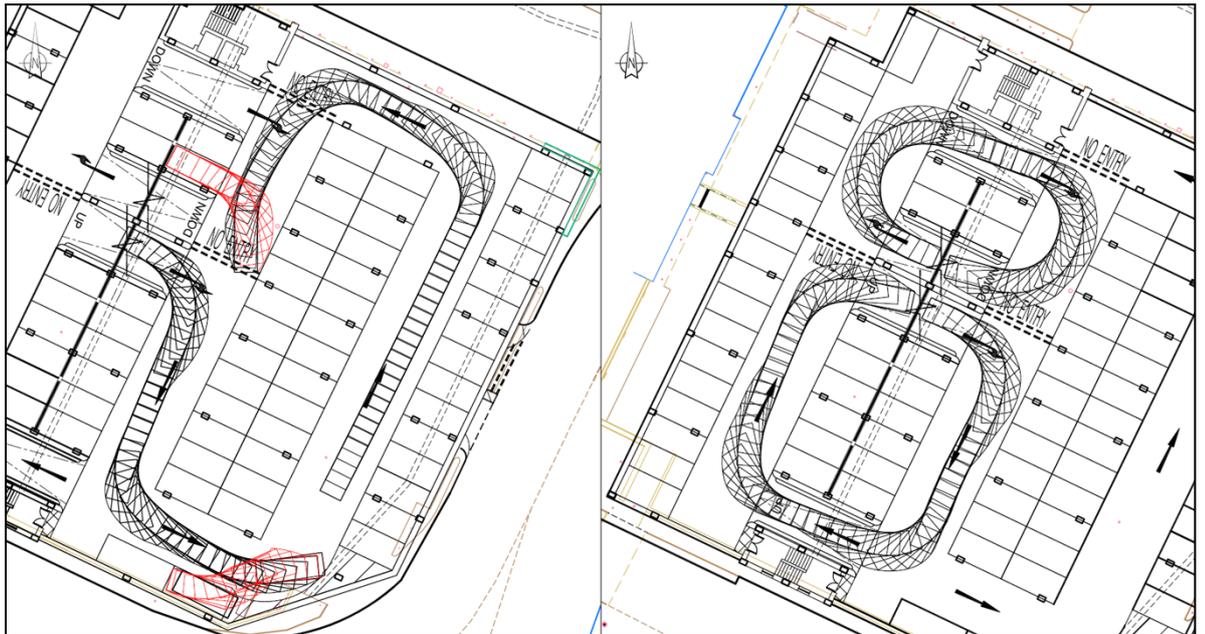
Large Car Access, Egress and Key Space Parking on MSCP Ground Floor
